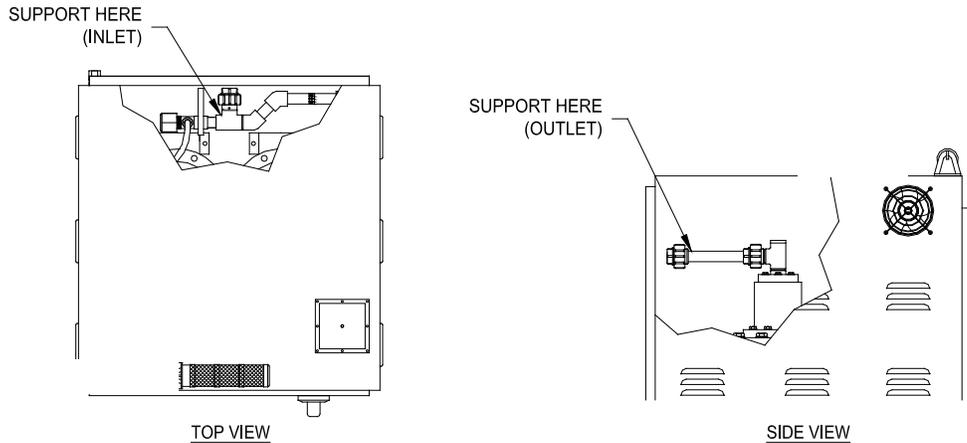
Support Internal Piping when Connecting Plumbing (105-156kW unit shown)
